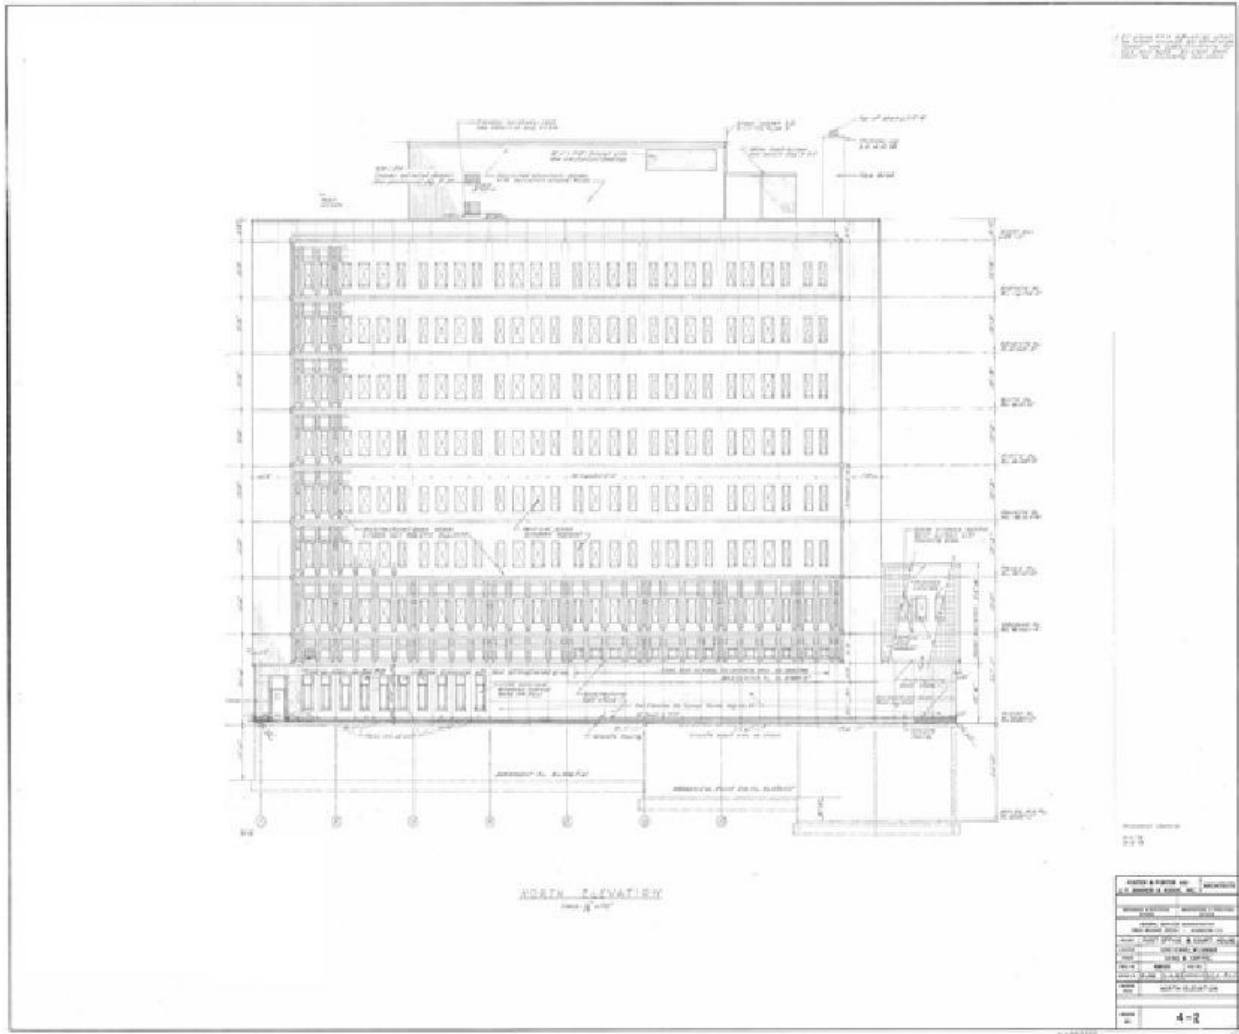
United States Post Office and Court House 1963 Plans, North Elevation
